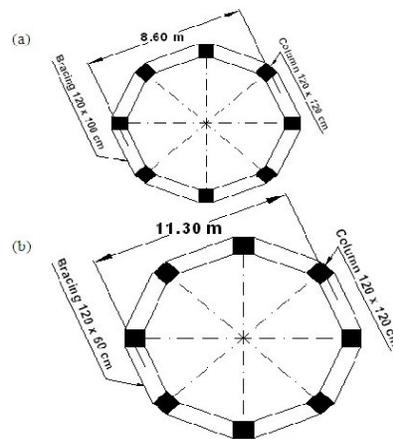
(a) Arrangement of the columns and beams under the tank container;
